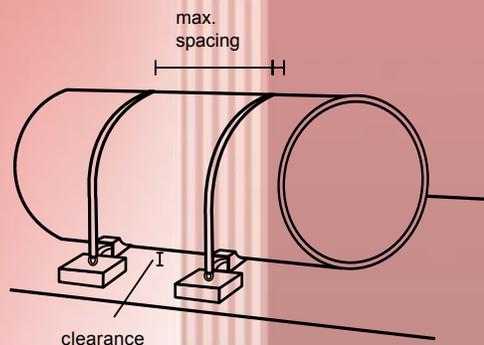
Pipe anchoring – Maximum spacing of straps see table Table 5-1
